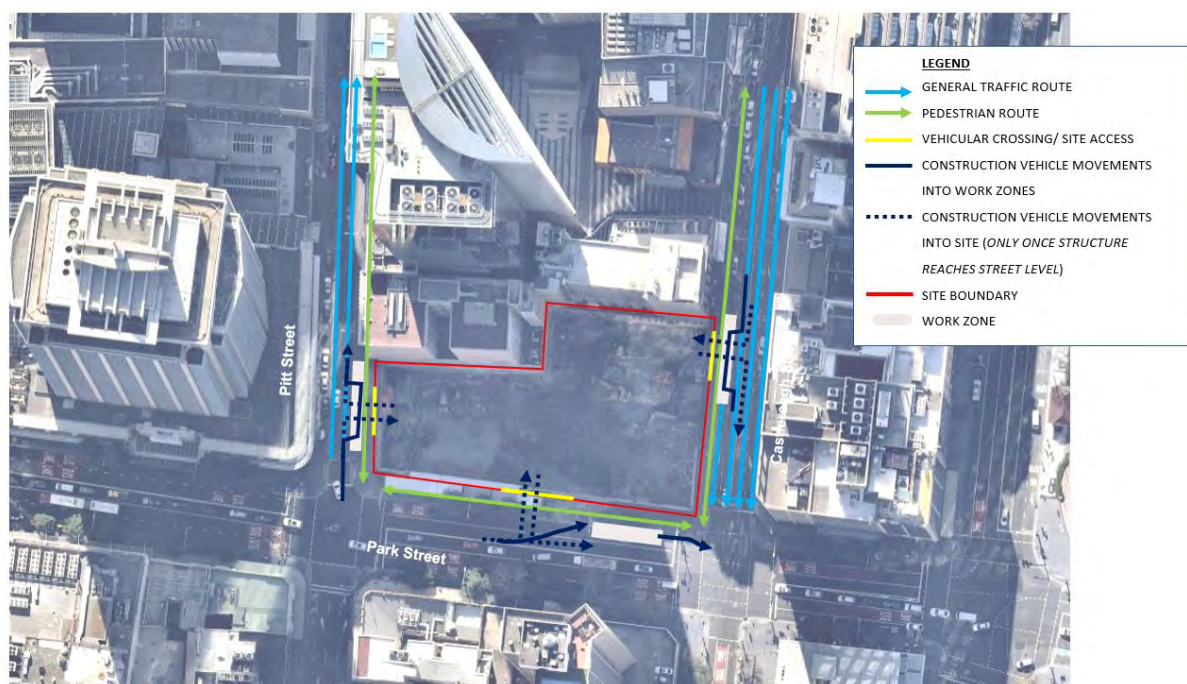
Stage 1S Indicative Traffic Staging Plan
